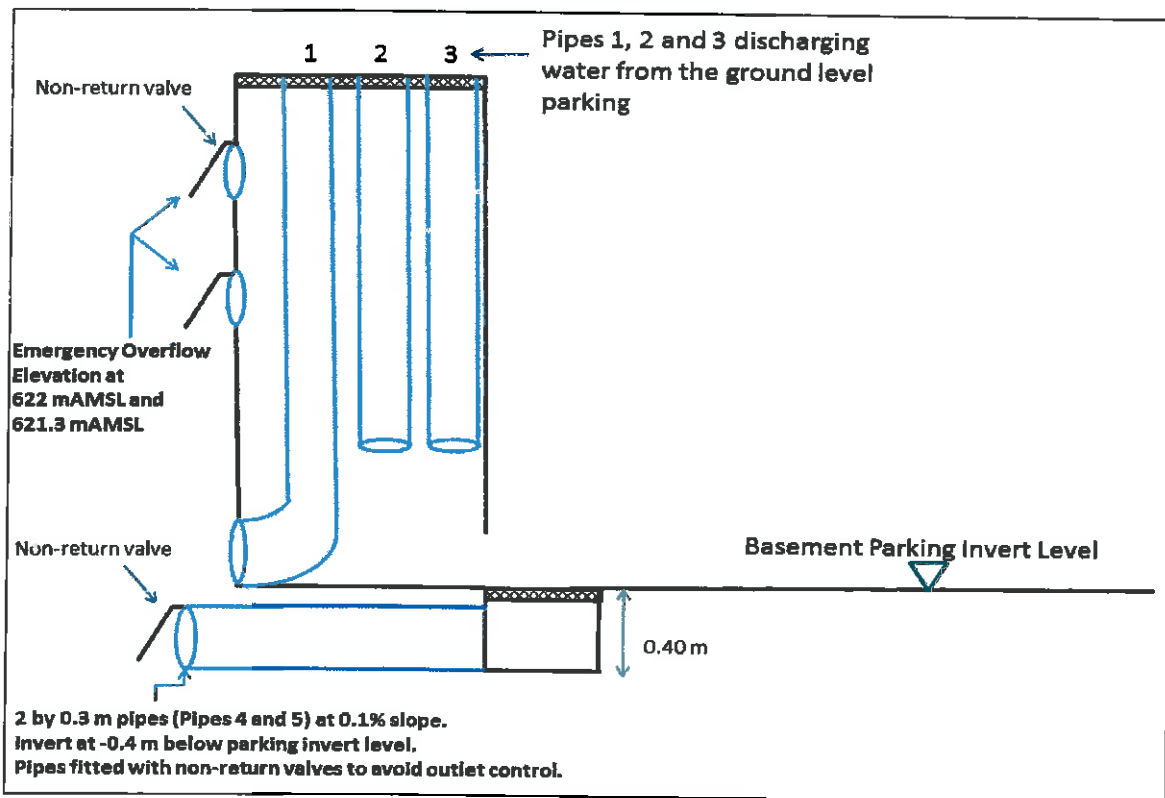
Conceptual Long Section Schematic of the Basement Level Sump, Catch Pit and Stormwater Diversion Pipes.
